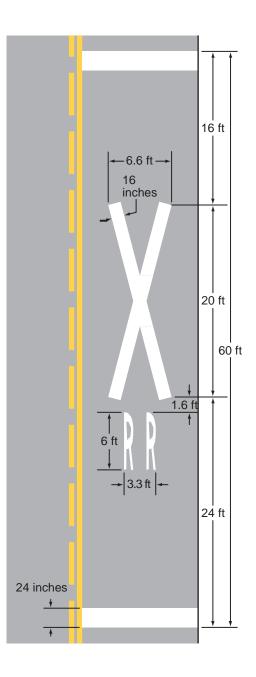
ROADWAY PAVEMENT STRIPING AND ADVANCED SIGNAGE PLACEMENT
